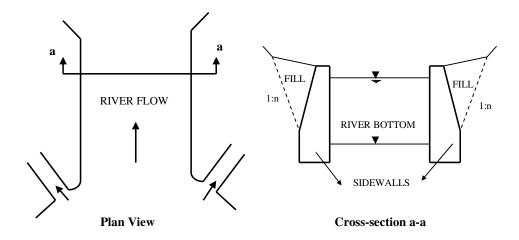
Plan view and cross-section of sidewalls (Yanmaz, 2001).
